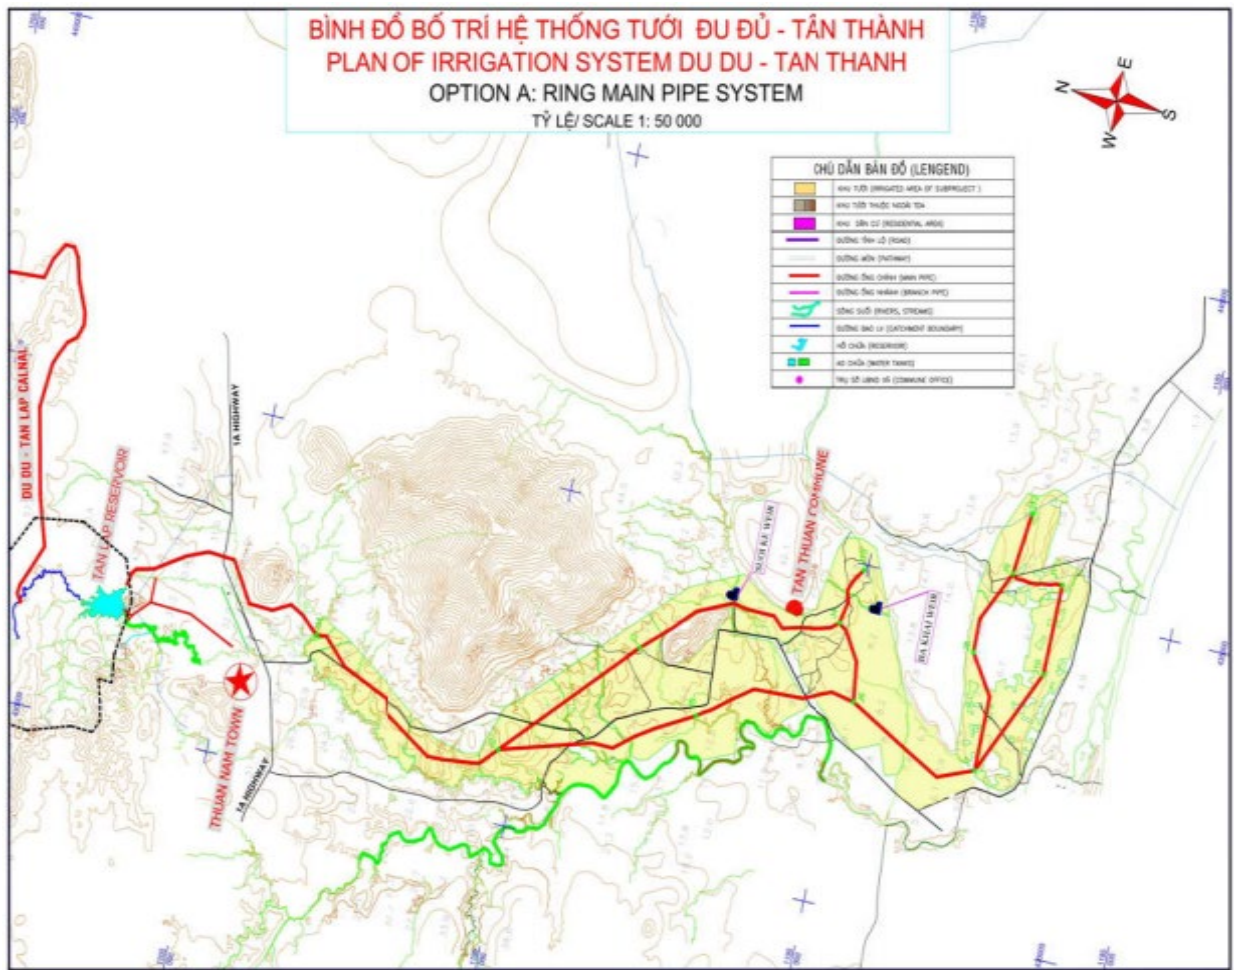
The layout of the irrigation system in Du Du – Tan Thanh subproject
